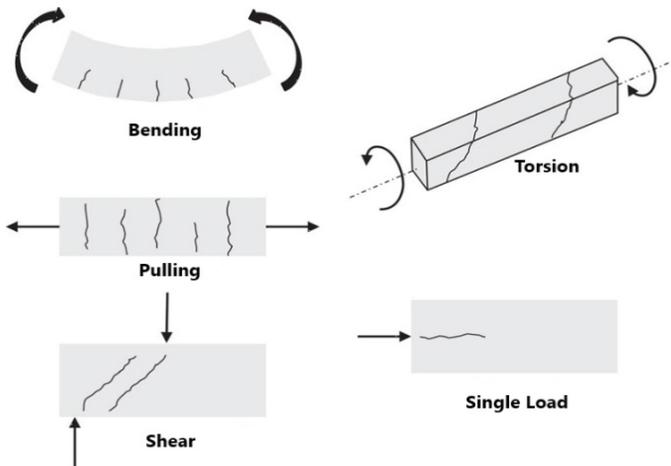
Structural cracks that may occur in reinforced concrete elements
